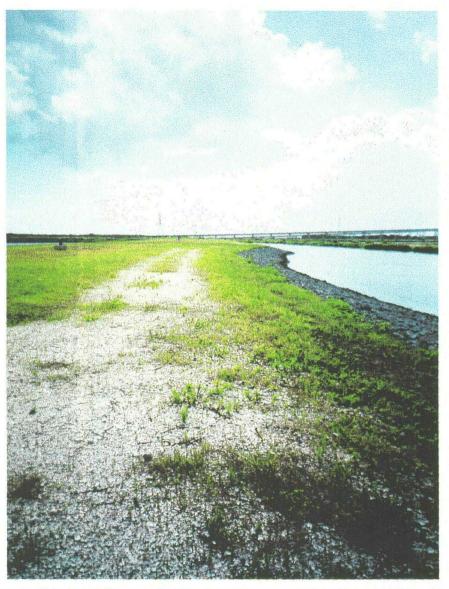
of 23 Date: 7/10/00 Time: 10:45 Taken by: Mark Taylor View of the west end of the North Dike Area looking east towards the Rainbow Bridge.
